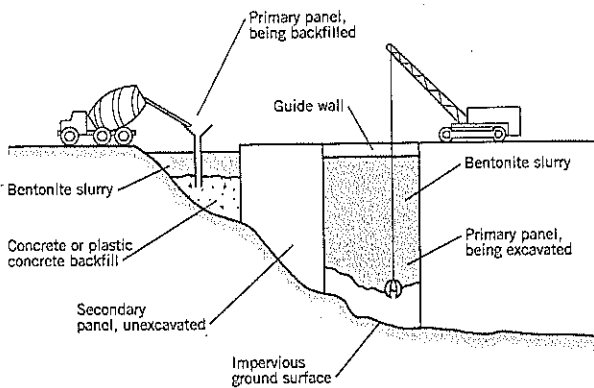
Construction of a concrete cutoff wall by alternate panels (after Millet et al., 1992).
